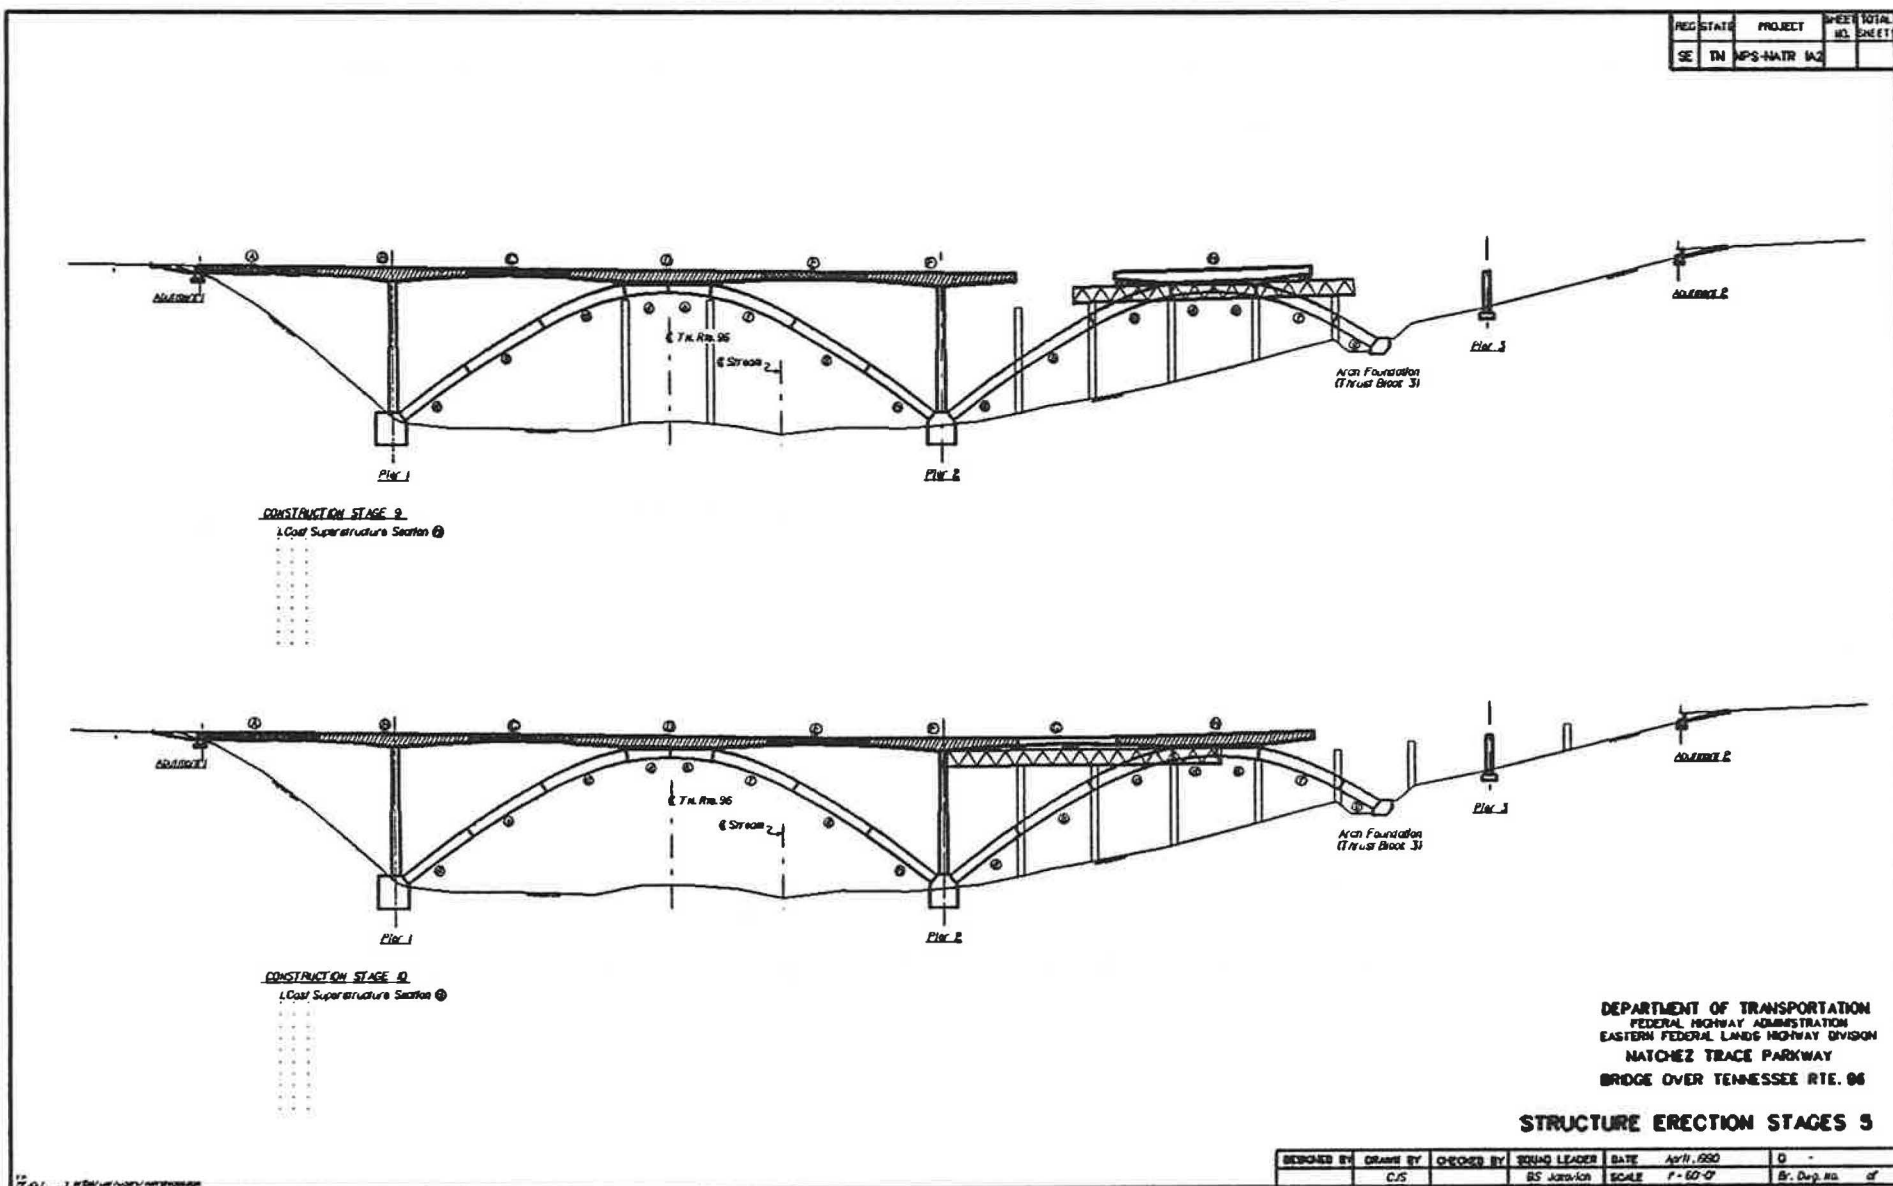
Construction stages 9 and 10 showing arch 2 (span 6) cantilever and span 5 closure placement
